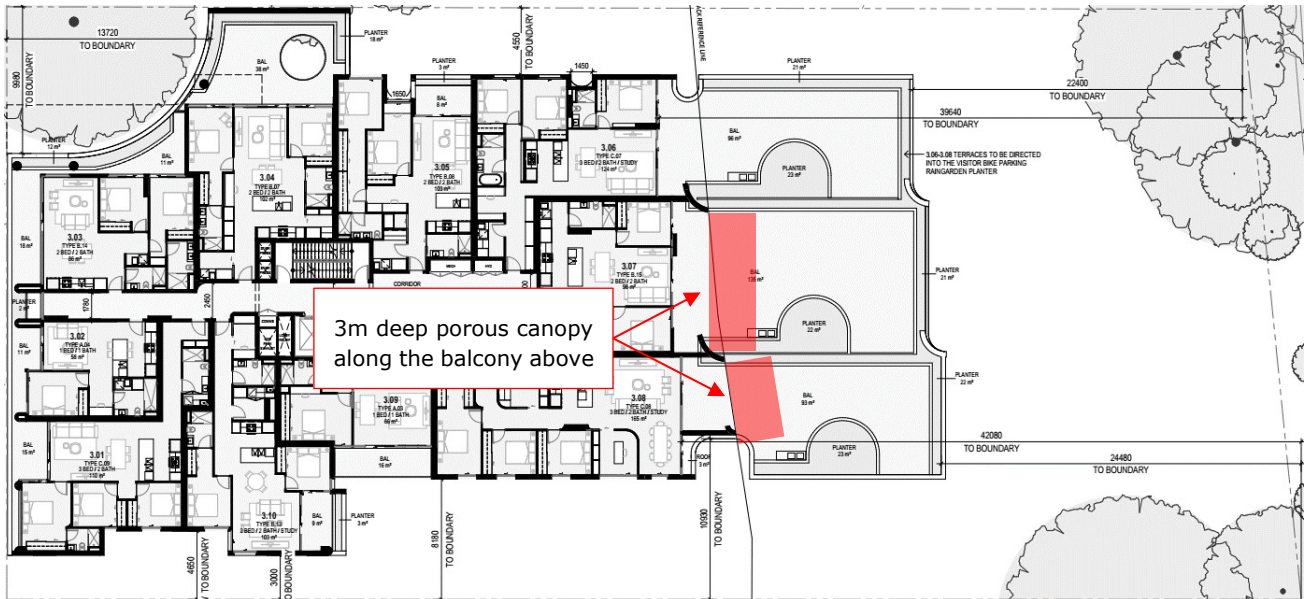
Recommendations for wind amelioration overlaid on the Level 3 floor plan.
